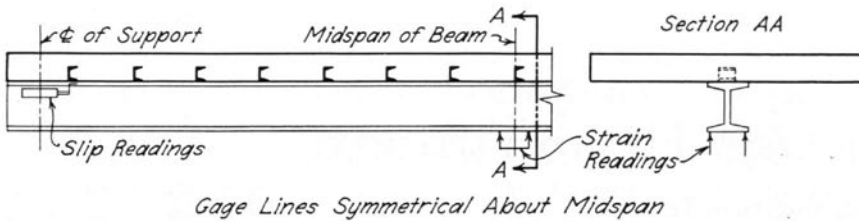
Location of Gage Lines on Beams Tested in Fatigue
